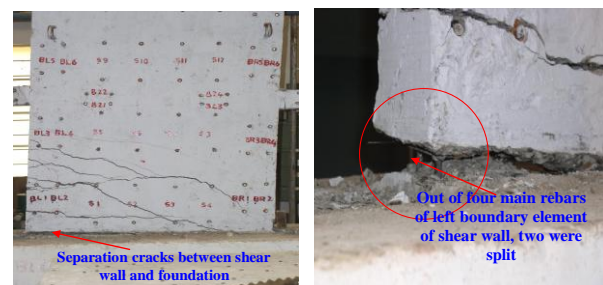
First storey shear wall (No cracks in second storey)
